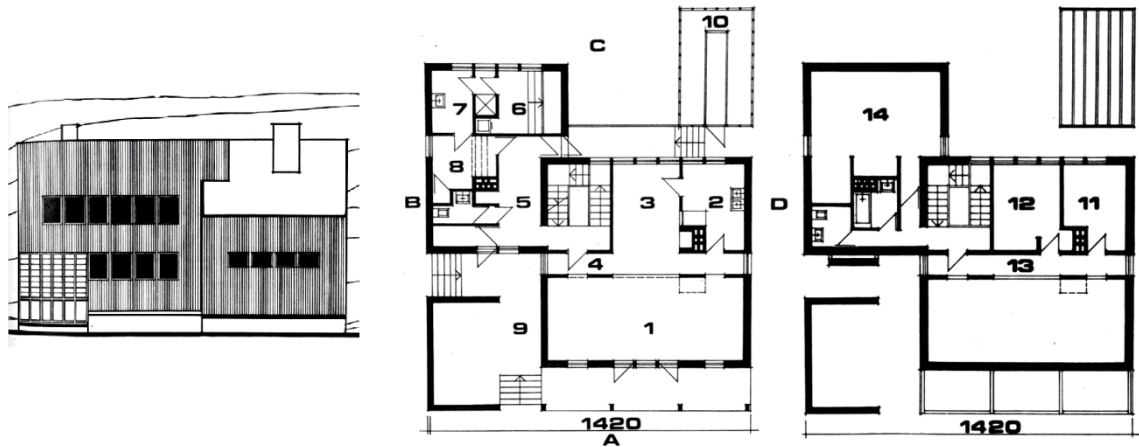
Project 88-74, an example of a partly two-floored dwelling from 1976 (left to right: elevation; ground floor; upper floor) (Berends & Dobrůš, 1976)
